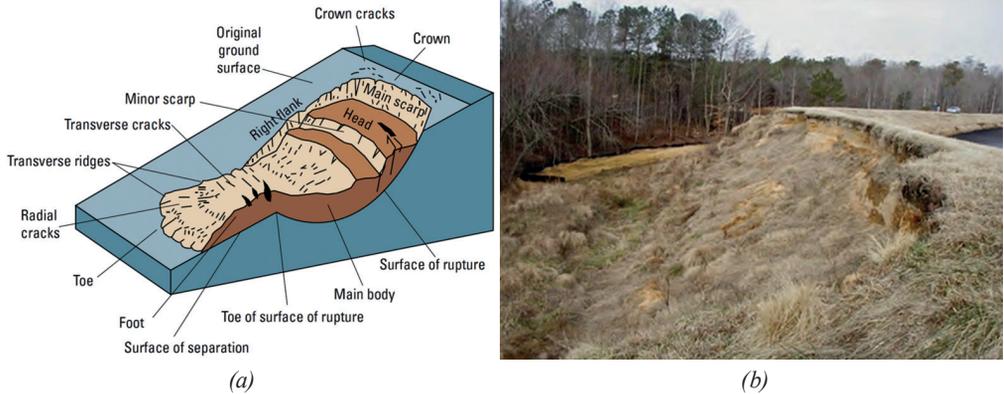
(a) Landslide terminology and (b) typical slope failure on the downstream side of the dam [9]
